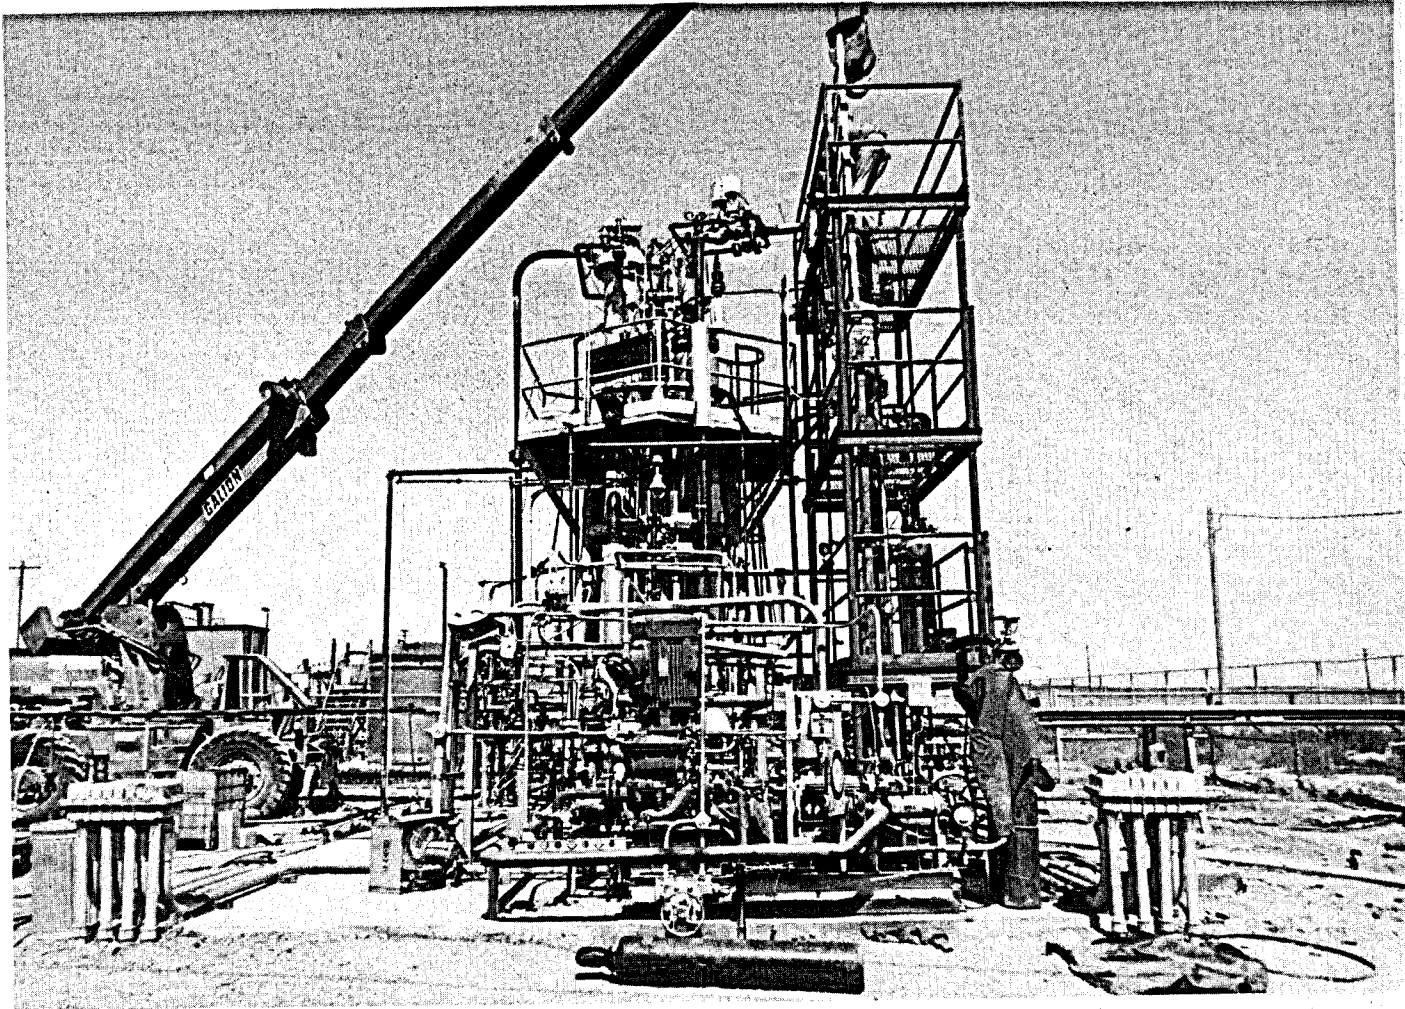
60kW(e) PROTOTYPE POWER PLANT FACILITY
